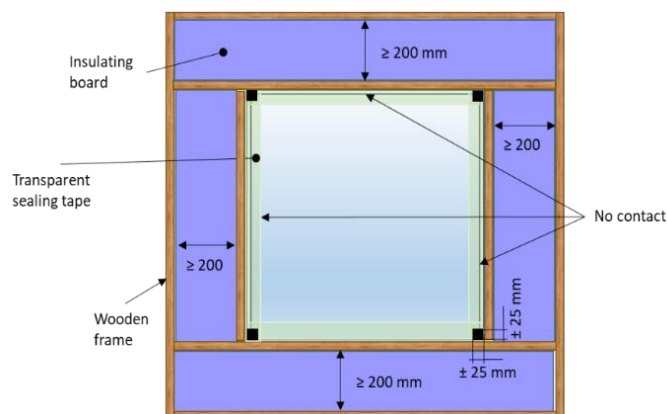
Example of specimen installation (front view of closing wall)
